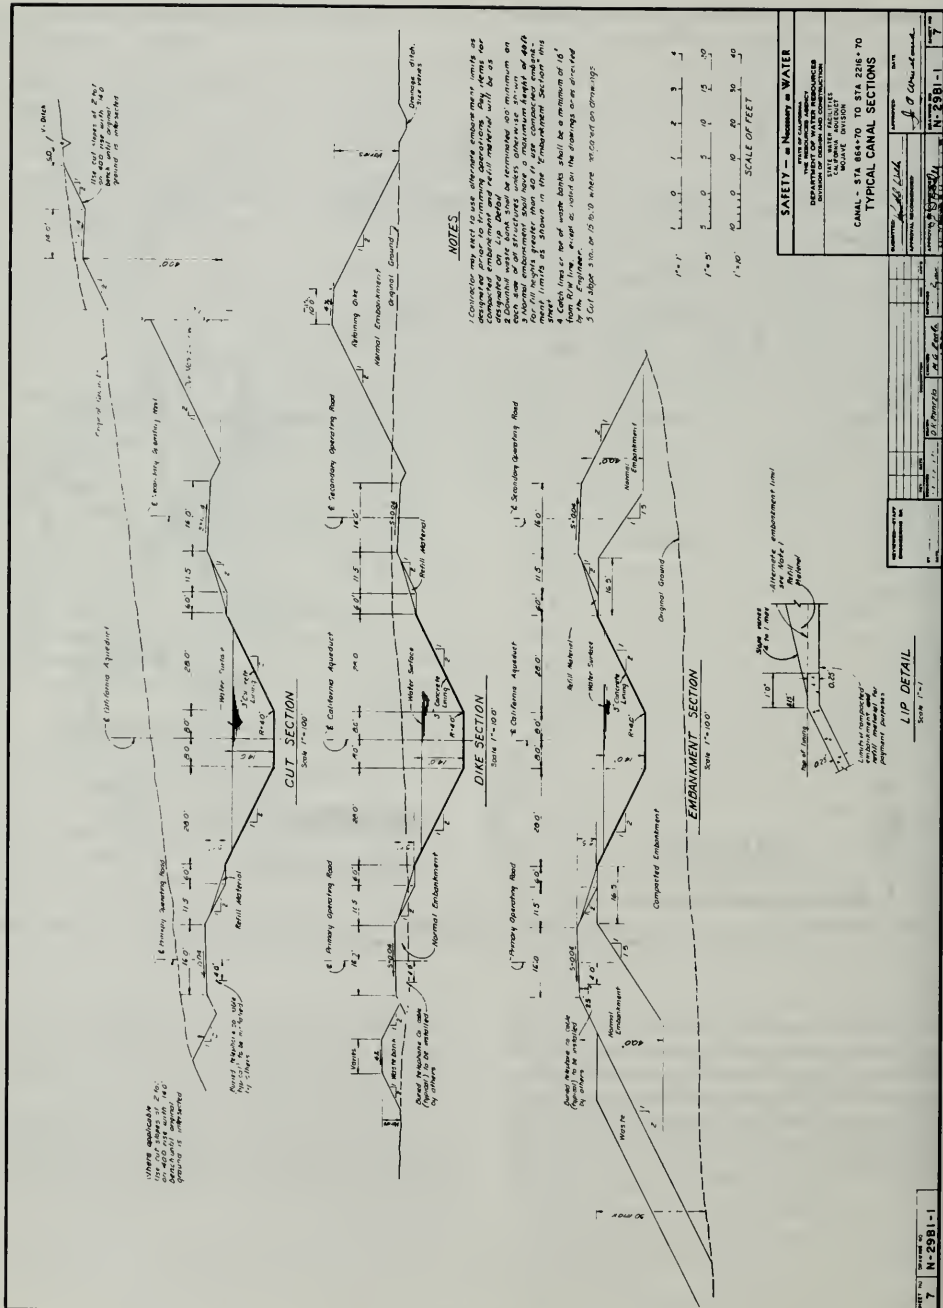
Typical Canal Sections—Los Angeles-San Bernardino County Line to Mojave Siphon
